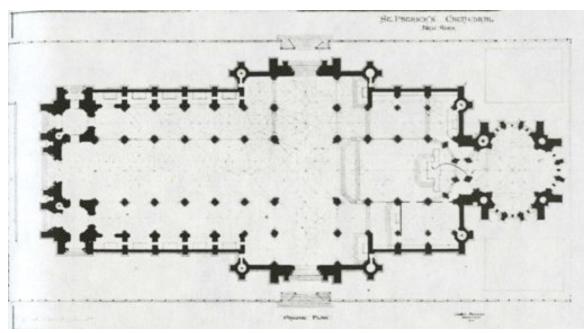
Plan for St. Patrick's Cathedral showing proposed Lady Chapel.
